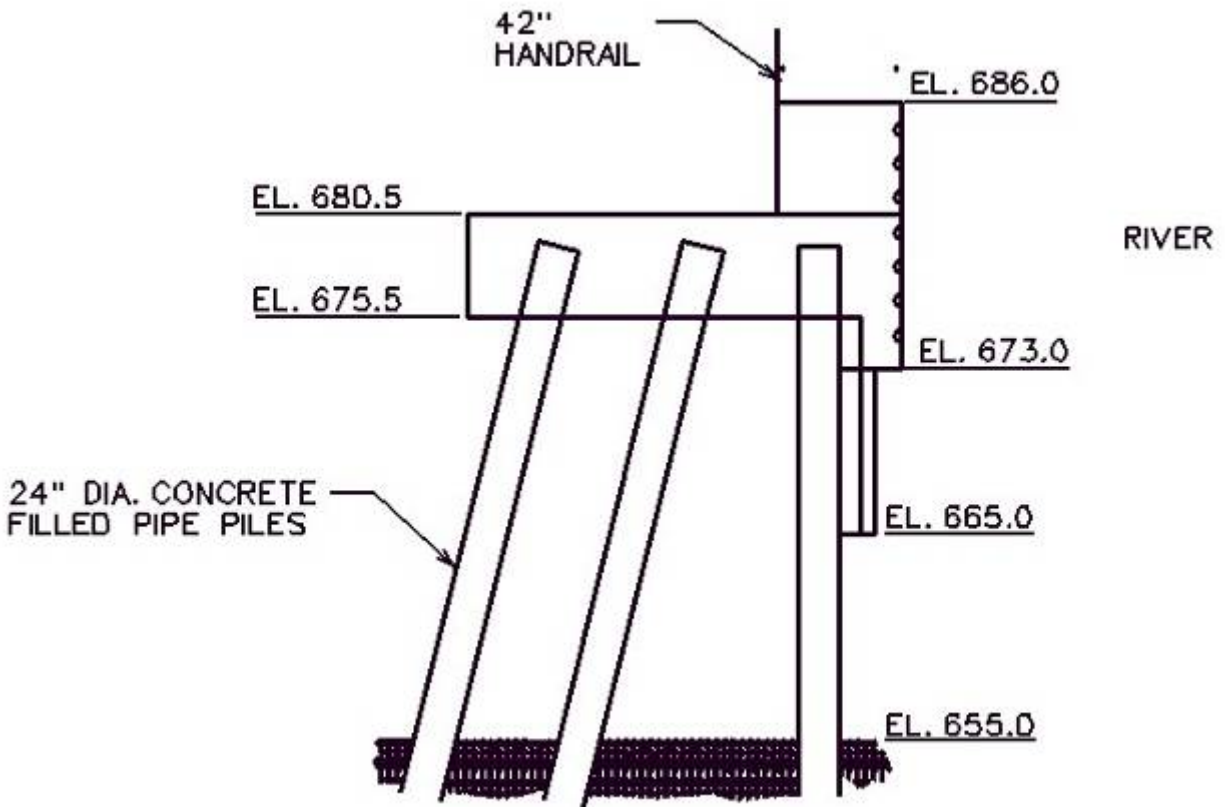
Extended guide wall design with concrete cap on pilings.
